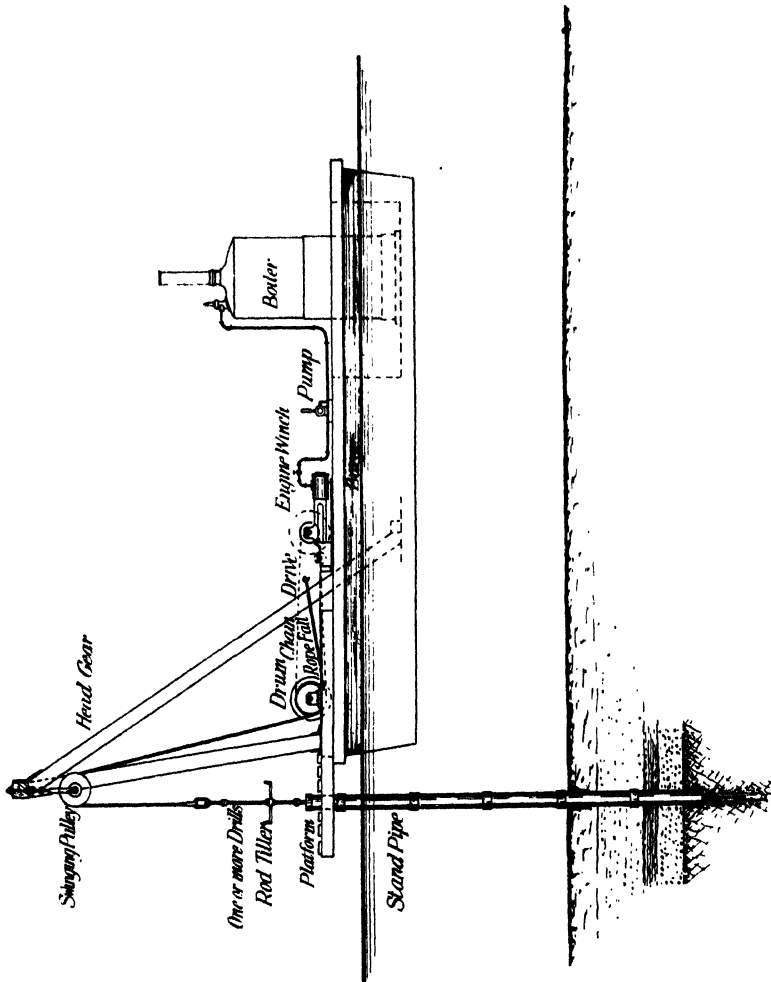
Multiple-drill Boring Barge, for Shallow Holes.
